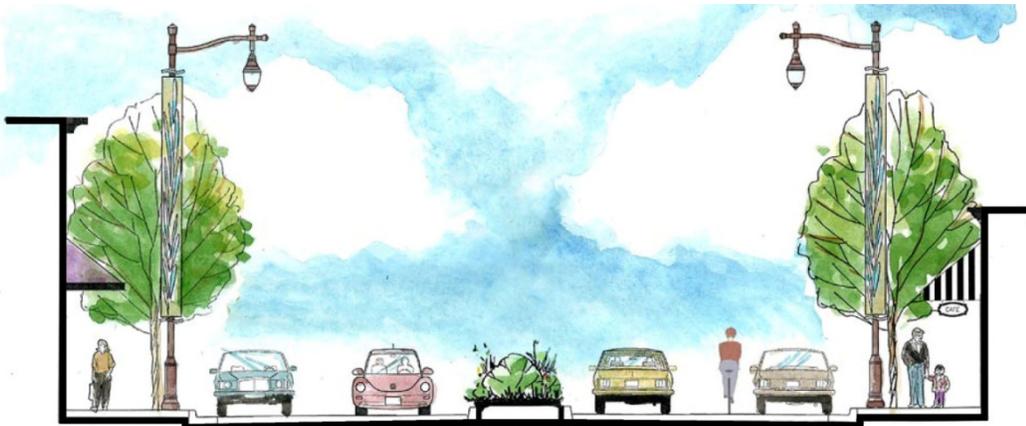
EXAMPLE OF NEIGHBORHOOD STREET DESIGN
